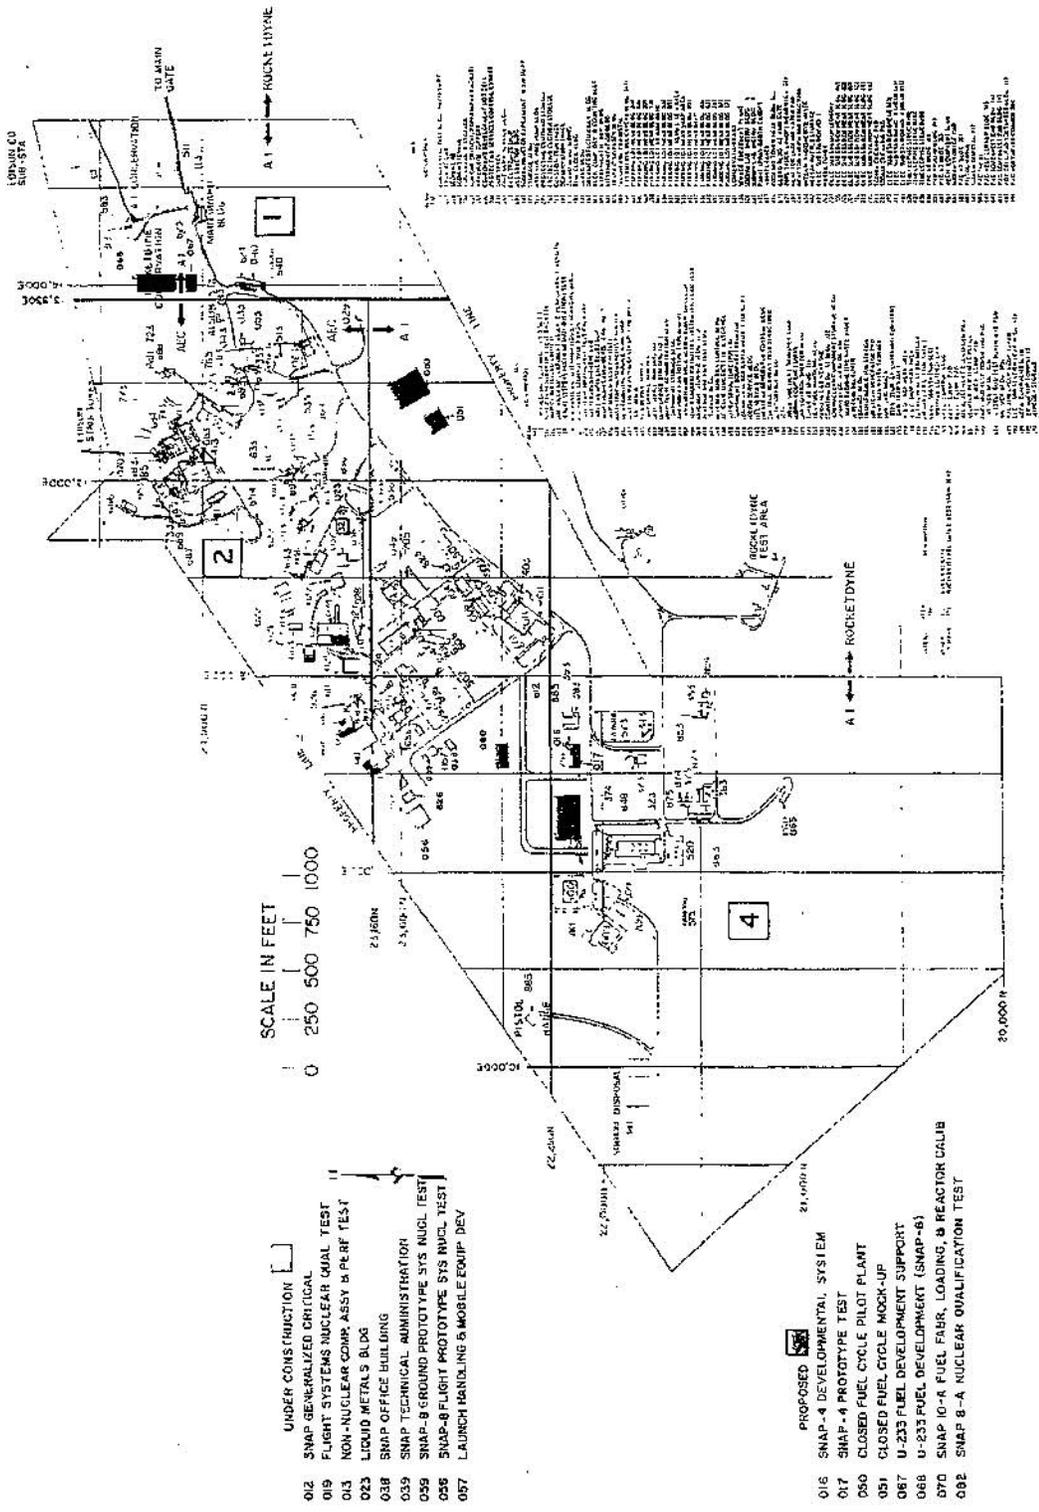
, Layout of Future Facilities on Nuclear Development Field Laboratory
